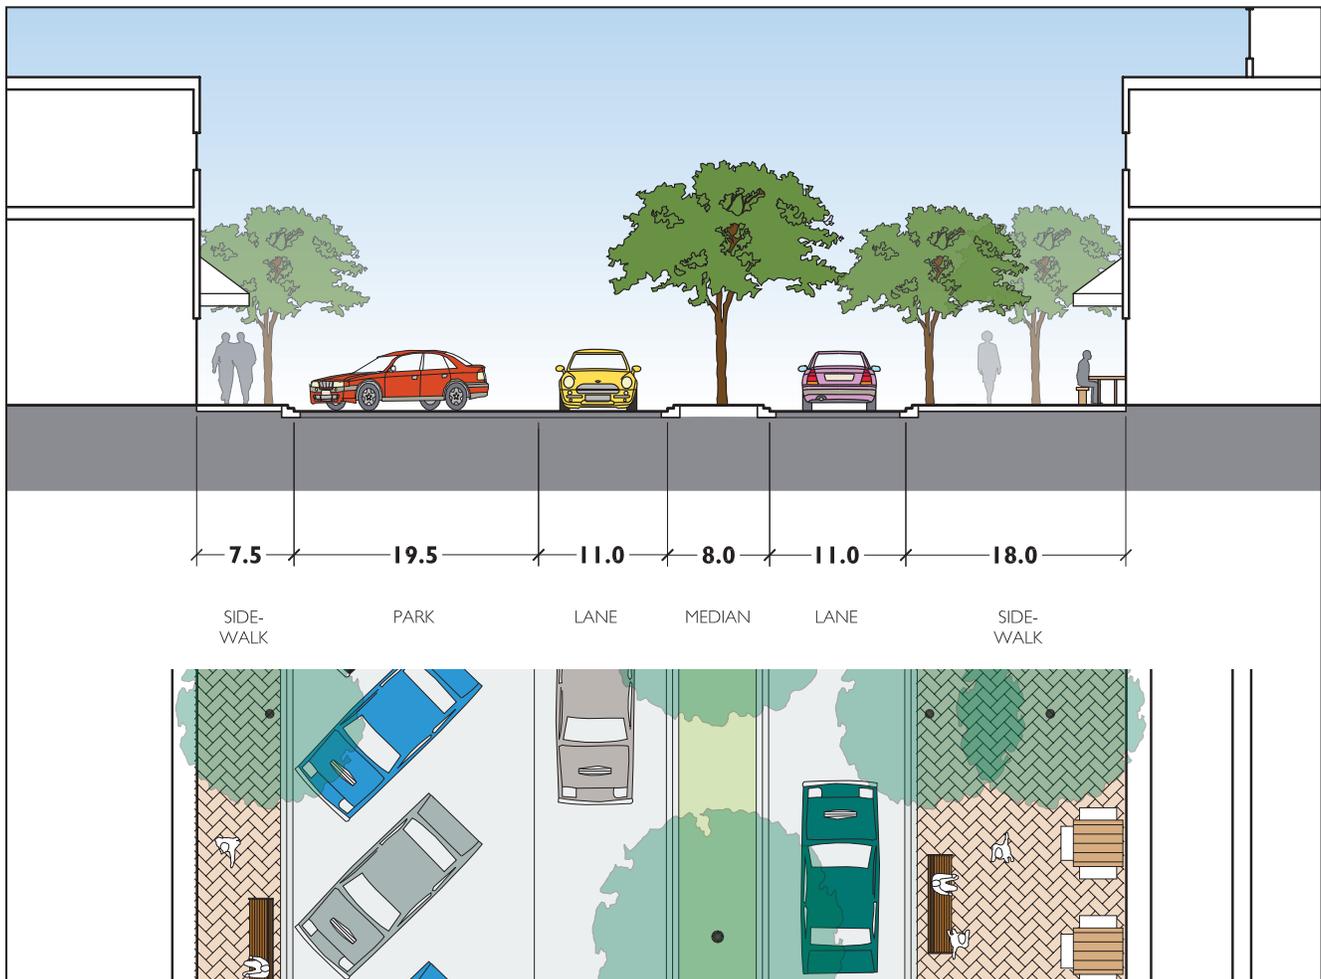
Proposed Santa Cruz Avenue Street Cross-Section and Plan.
